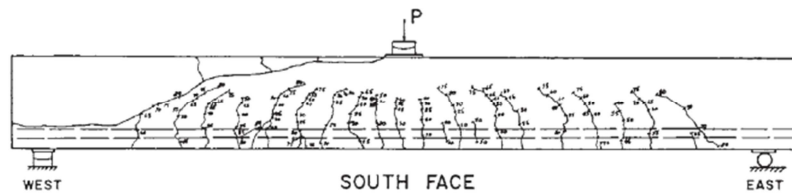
Typical crack pattern for diagonal tension failure, Bresler and Scordelis[43]
